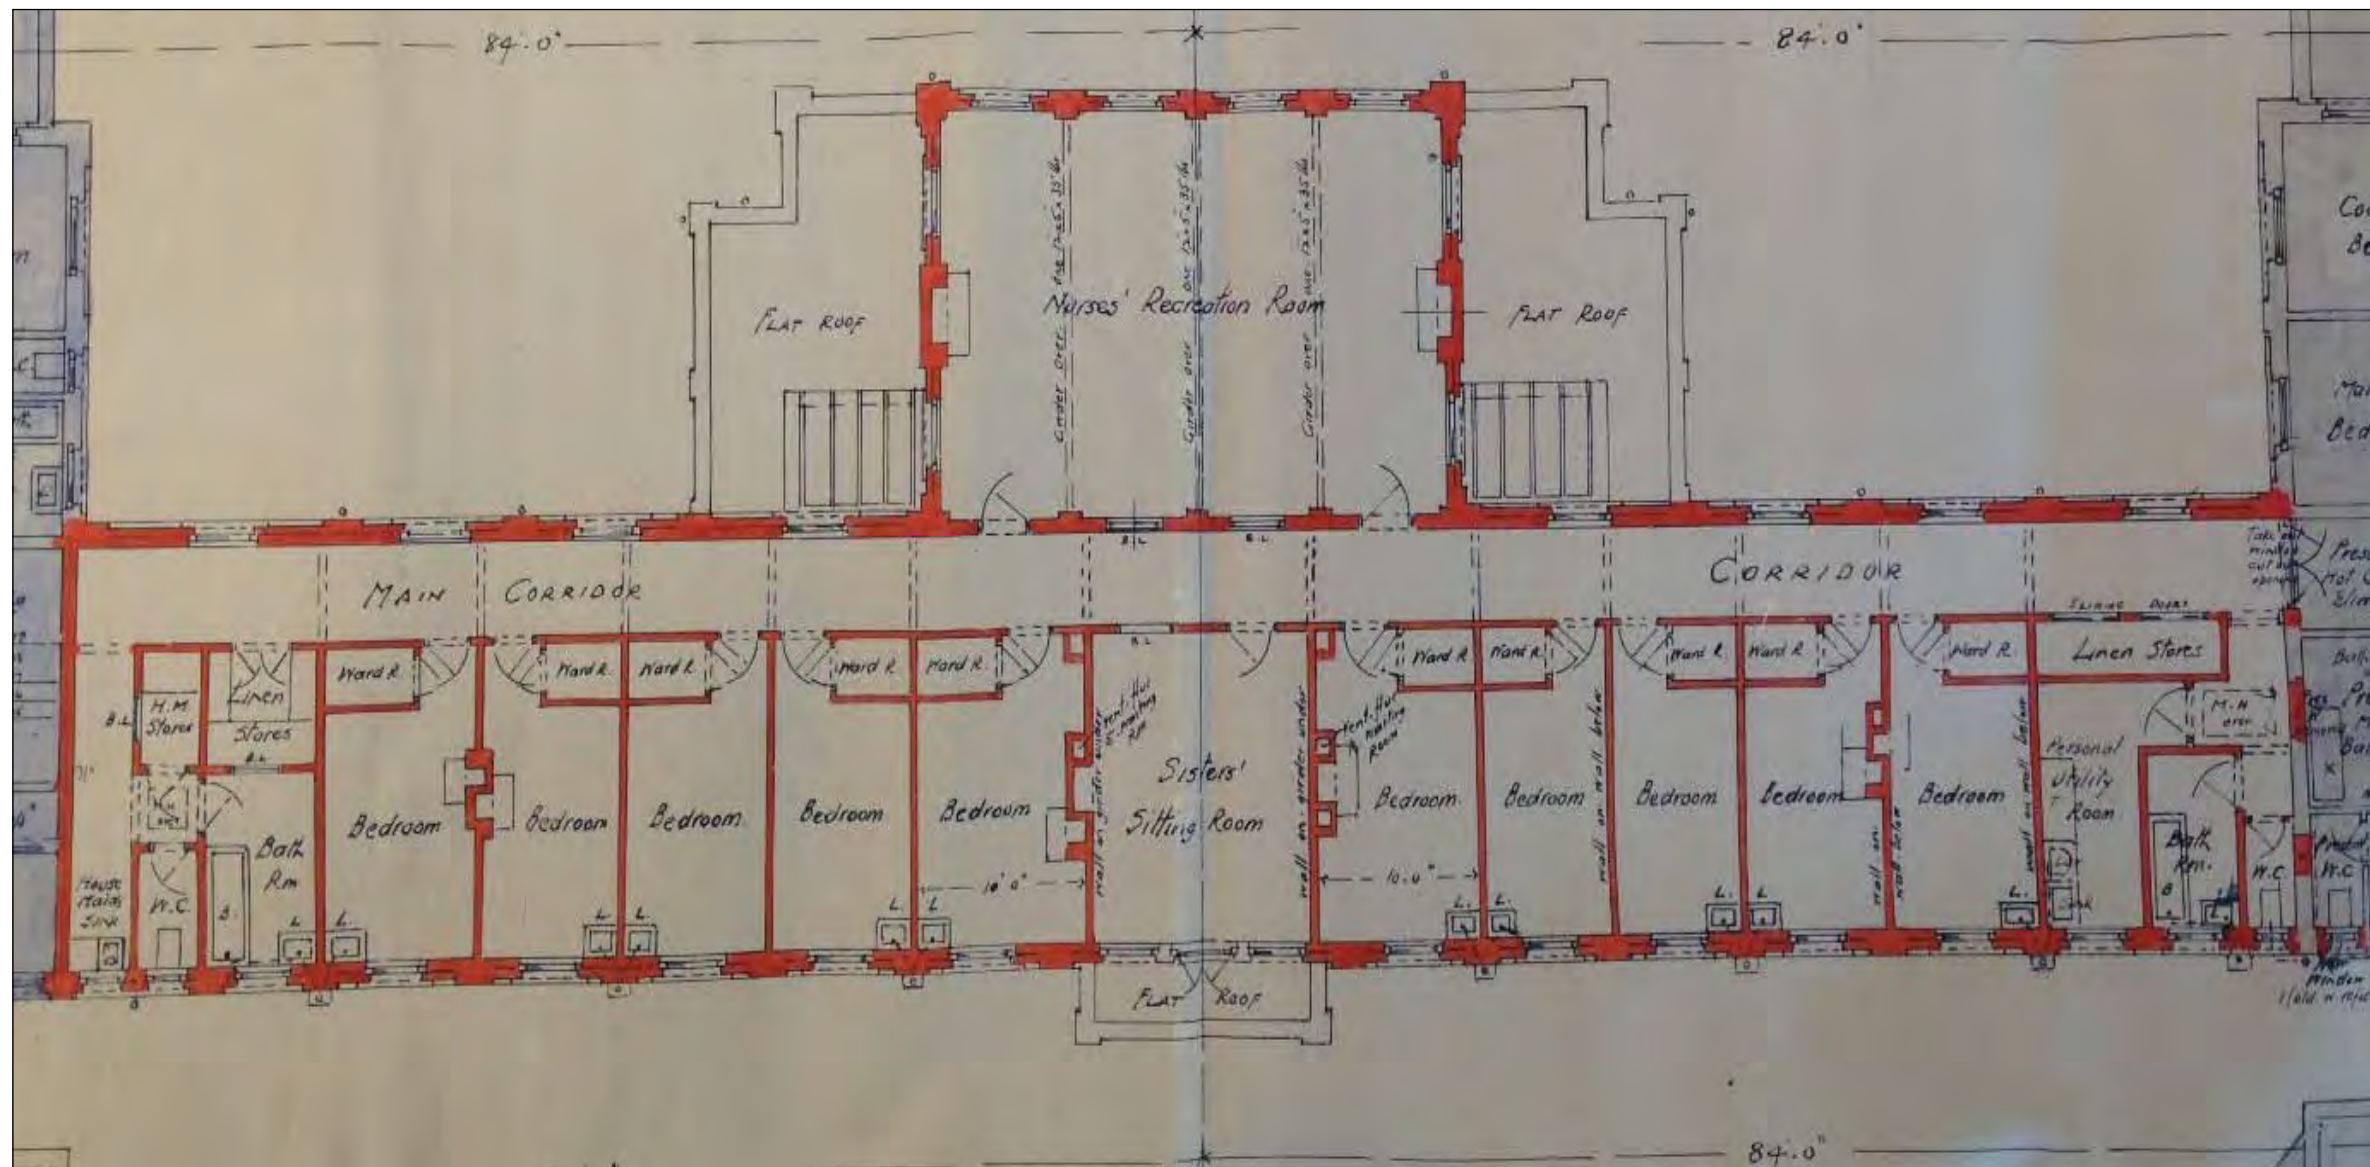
The first-floor plan of the outpatients' department (WYAS: Wakefield WMT/CA/4171, plan 2).
